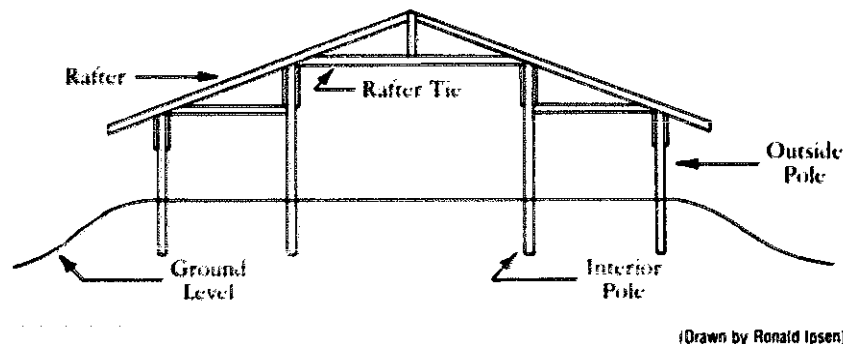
A cross section view of a pole-type building with a gable roof.
